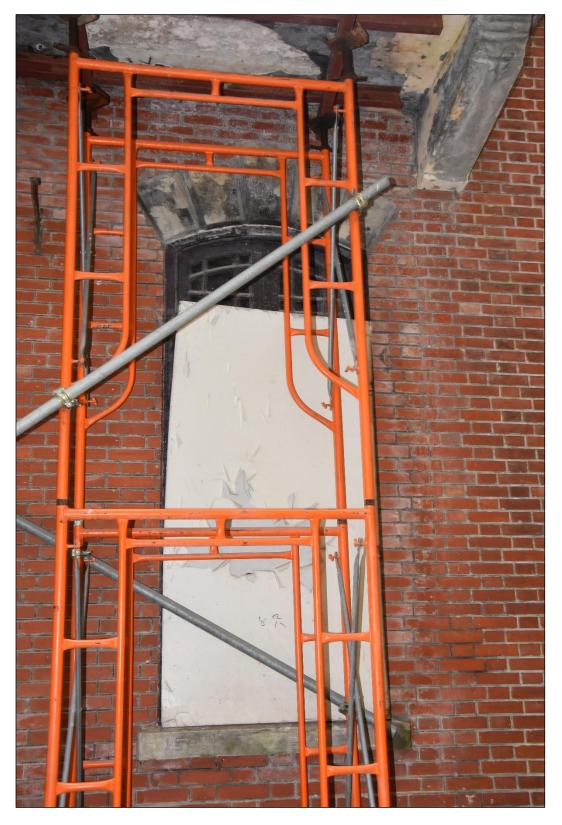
North-west elevation (facing Admiralty side), ground floor, window Wdw-Gf12, external side, covered with plywood panel, (21st March, 2023)
